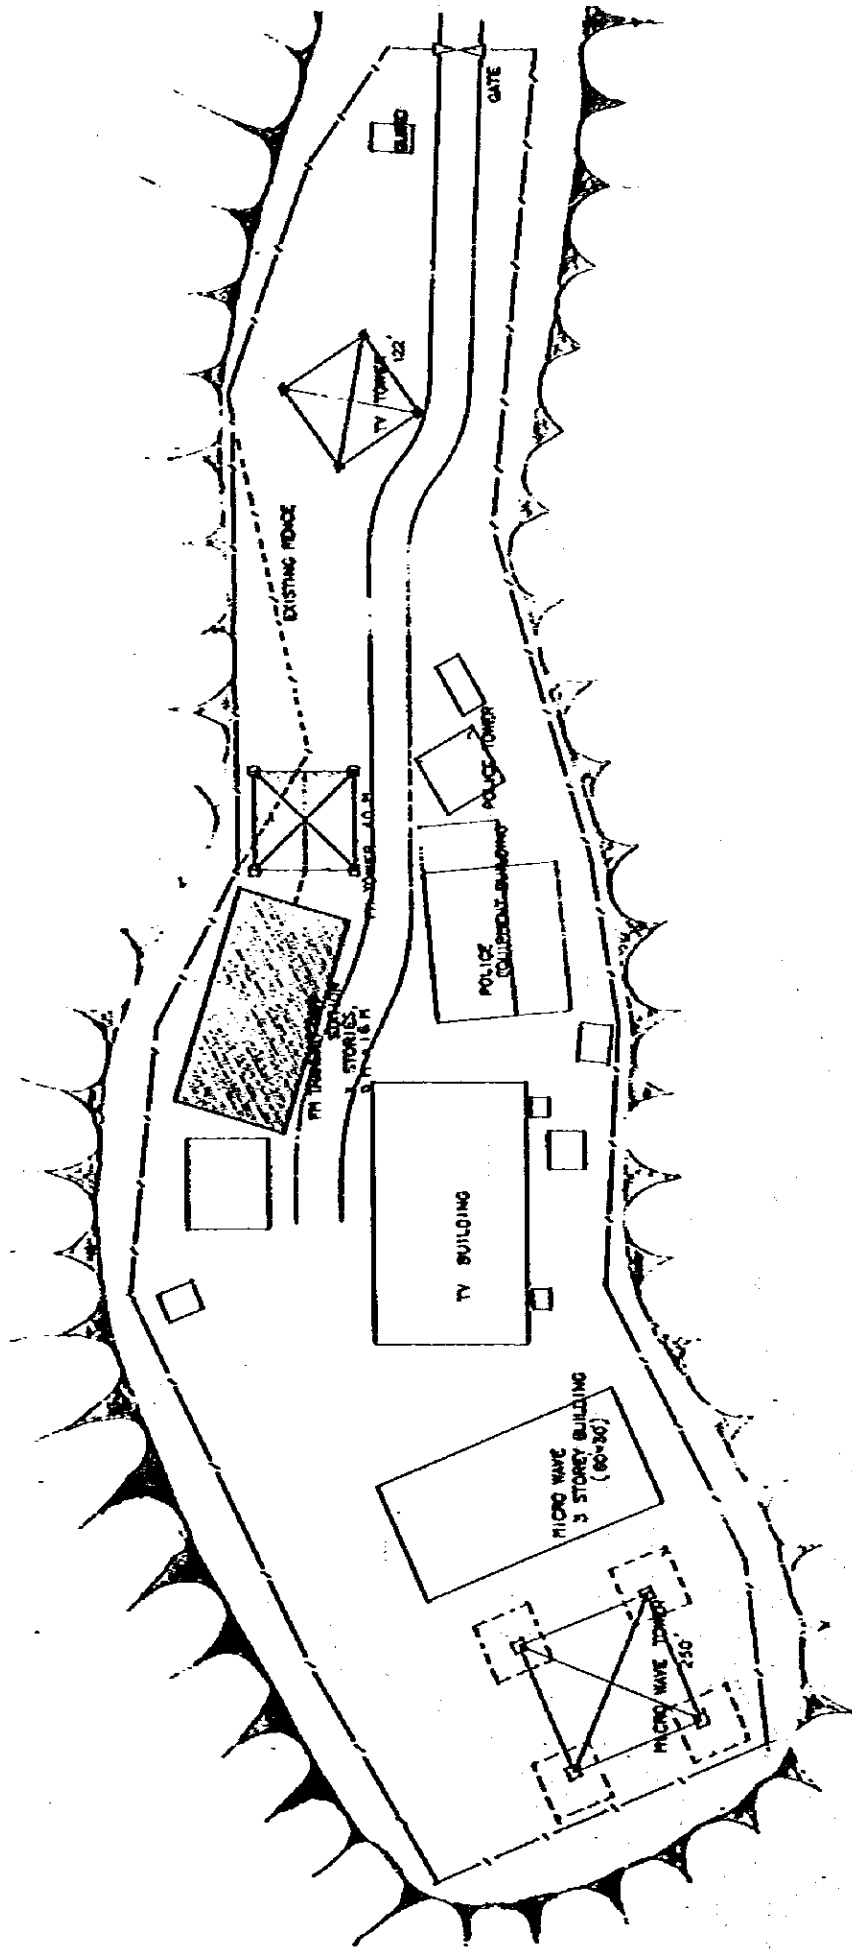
Site Plan -- G. Kledang, Ipoh
